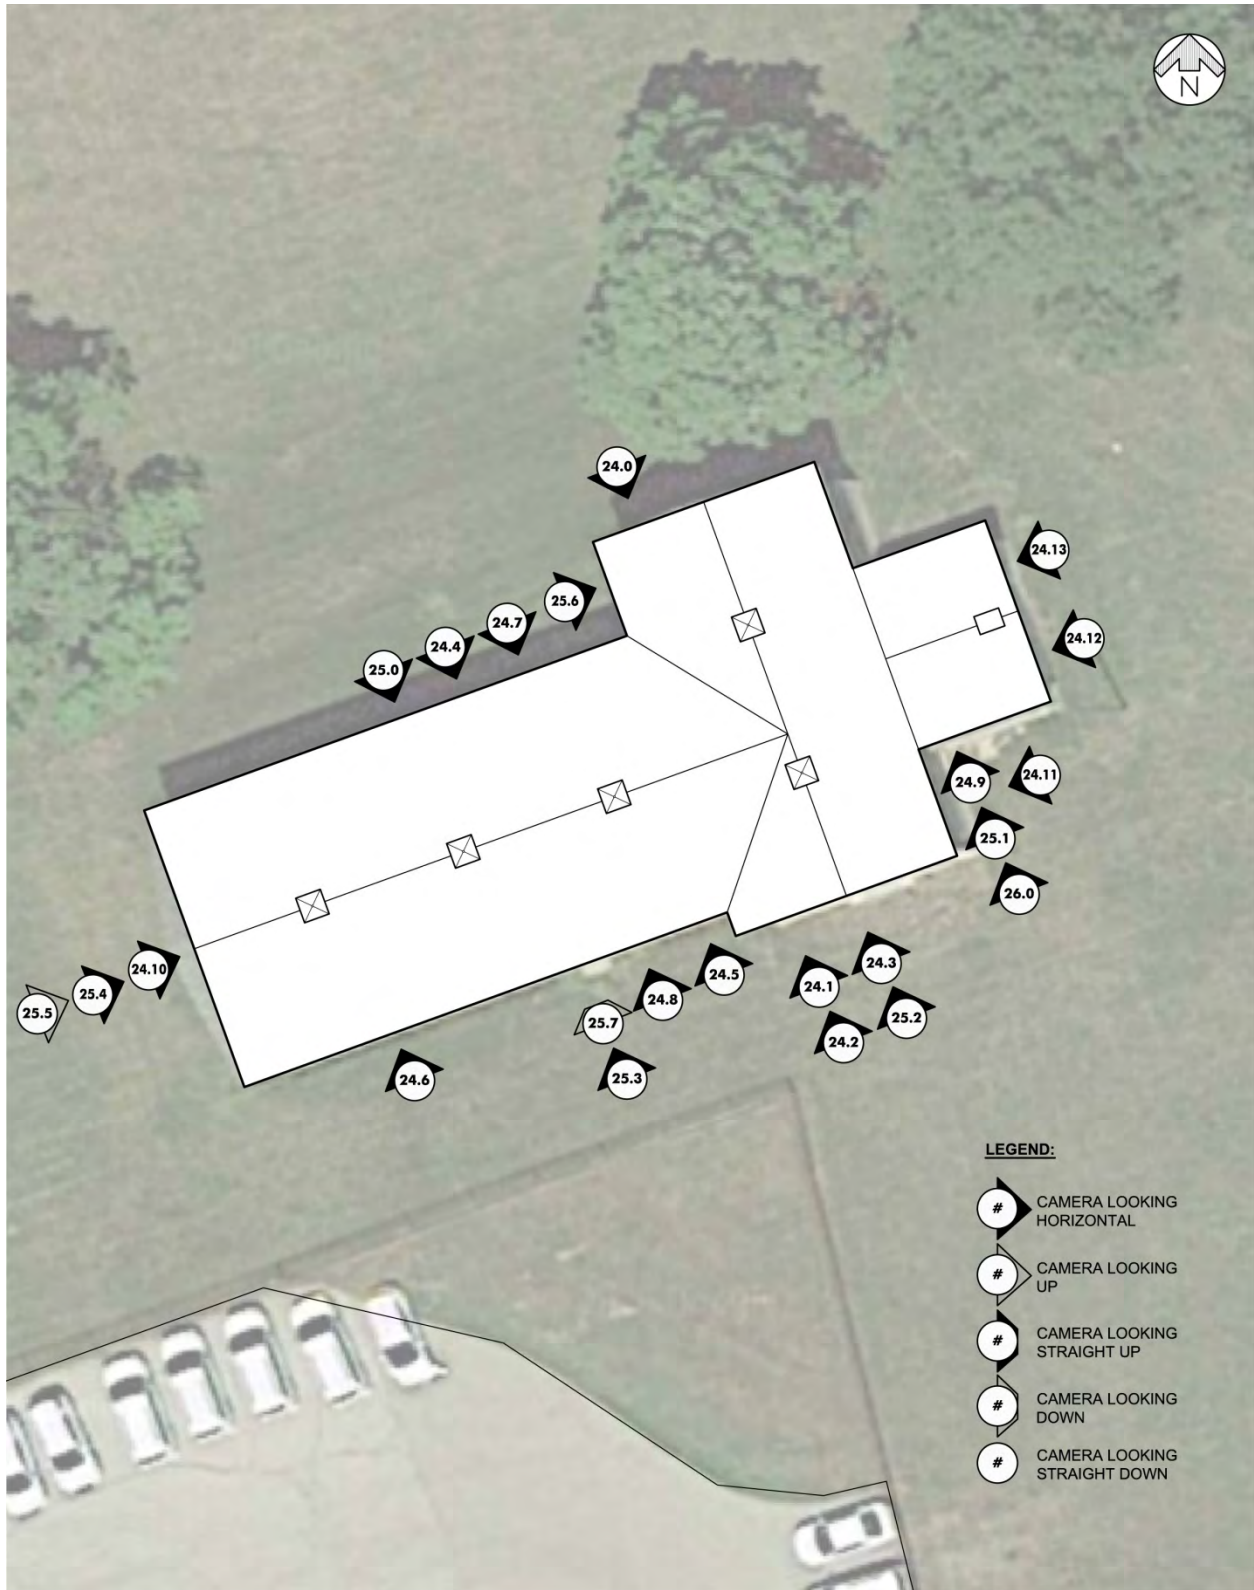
Photo No. 24.0 – 26.0 (Windows, Doors and Signage)
